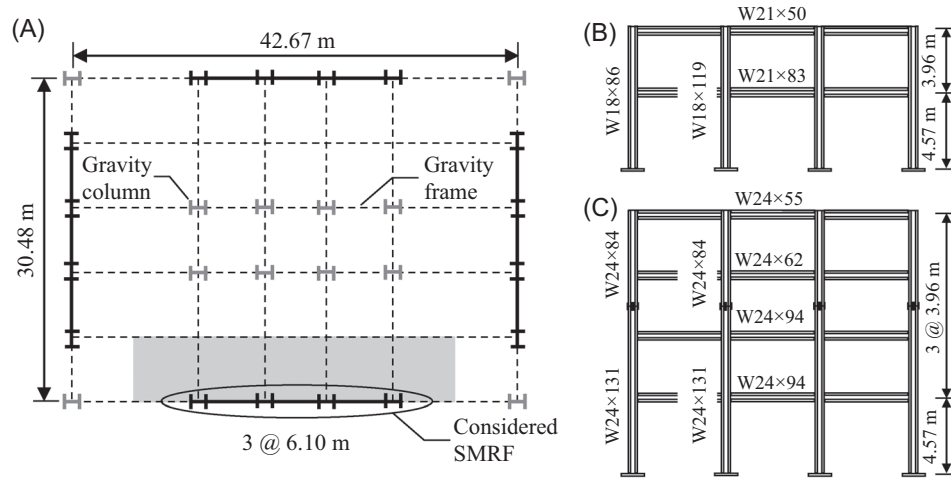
Schematic illustration of archetype frames: (A) plan configuration; (B) 2-story elevation view; and (C) 4-story elevation view.
